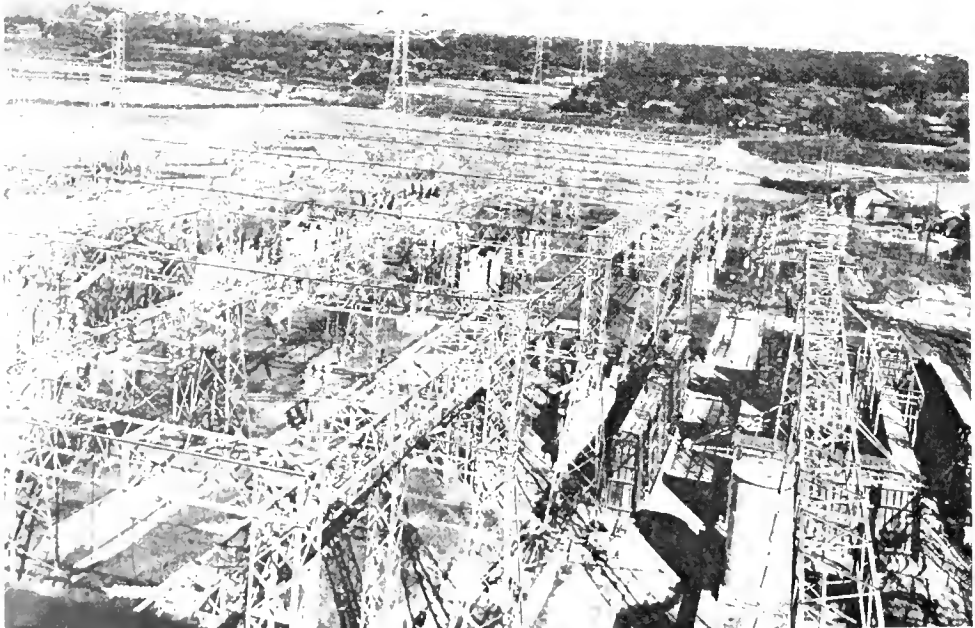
Imuyama General view, east substation, 77-KV Section and Transformer Bank. (Note bomb barriers)
